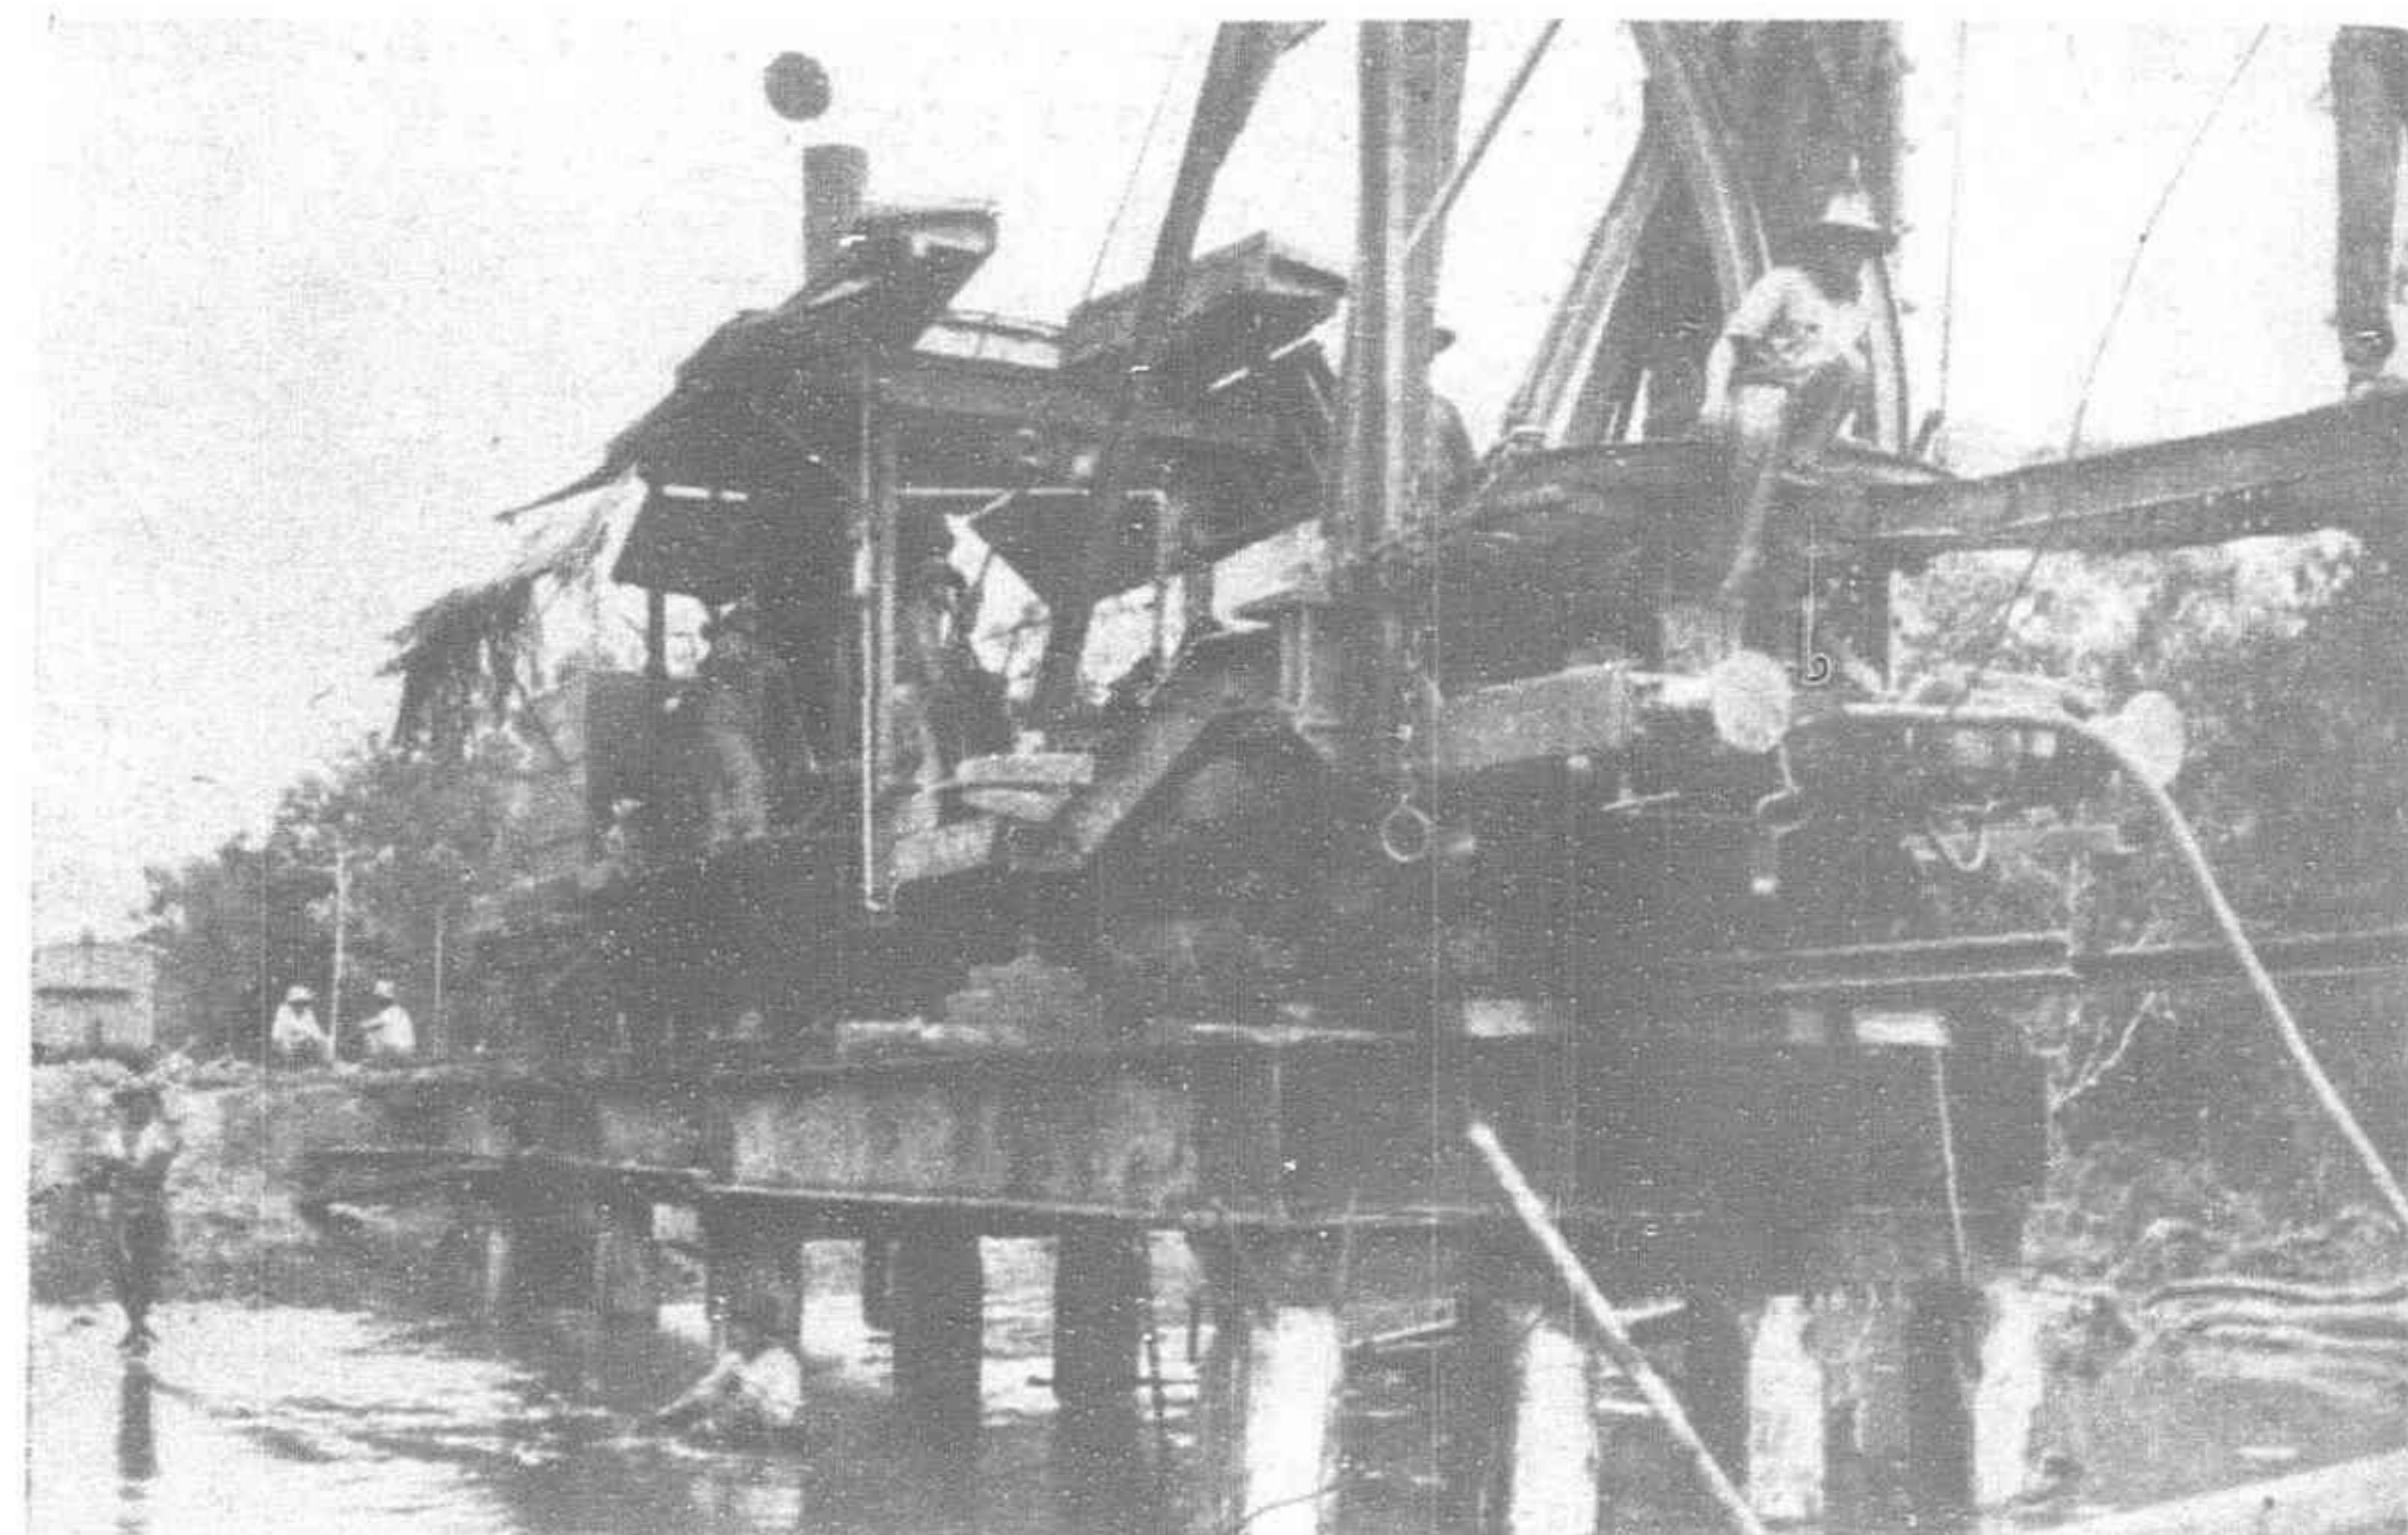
Driving Concrete Pile Bridge. Pile Capped with 10-in. I-Beam to allow immediate procedure of Pile-Driver and Trains. 10-in. I's become part of Reinforced Concrete Cap
